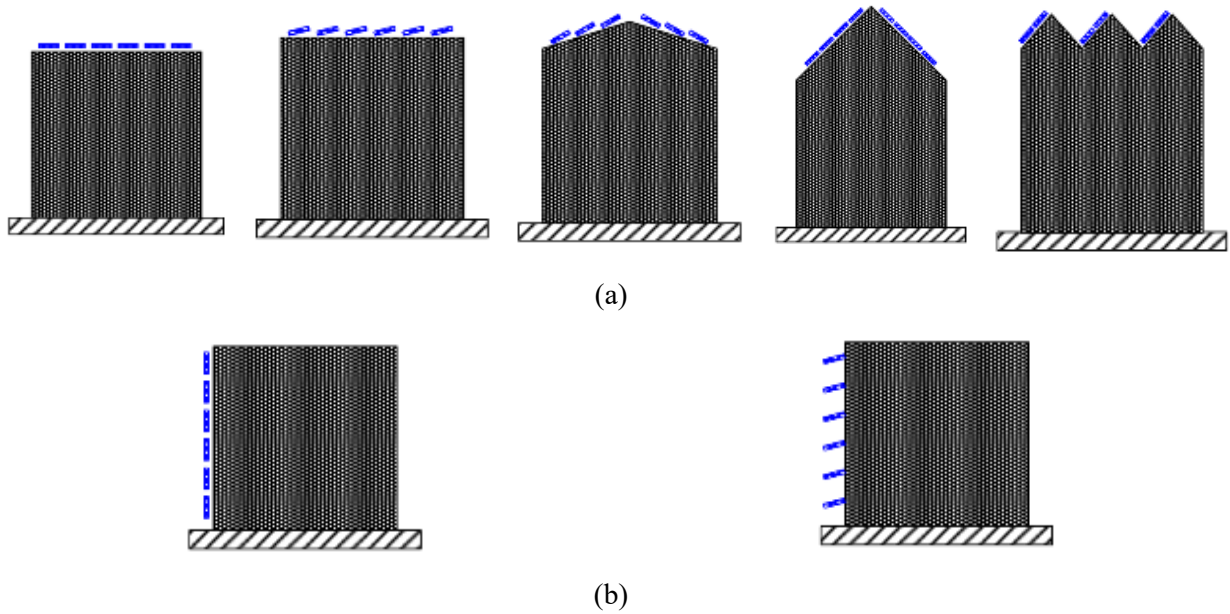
Possible installations of solar panels into building's: (a) Roof, and (b) Walls
